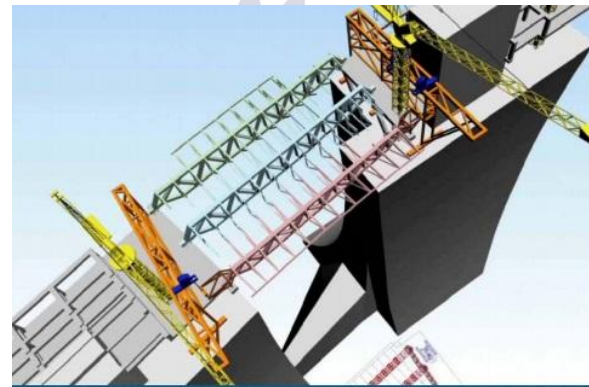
Pictorial view of Structure used in Cantilevered Construction
